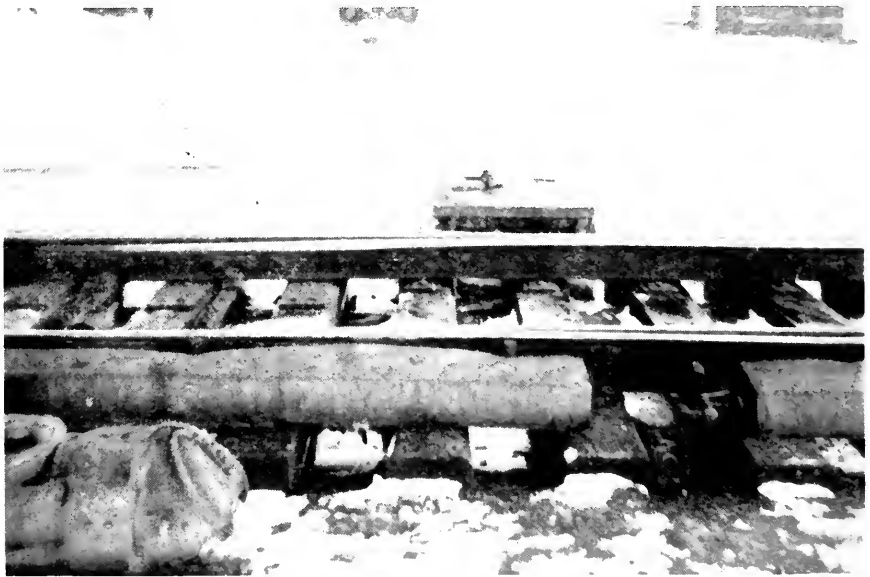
Side view of heater designed to burn various types of gas, showing protecting shields in place.
